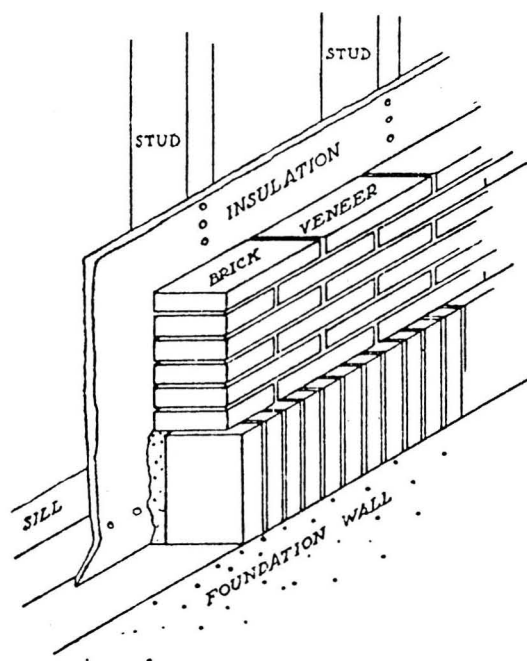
American brick veneer construction. Building, 12 April 1924, p 61, after Architectural Forum.
